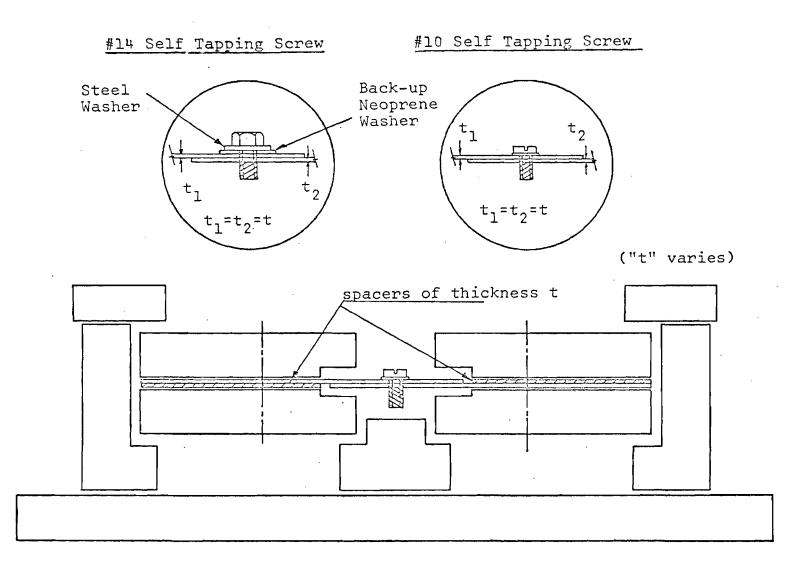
Section A-A for Screw Fastened Sidelap Connections
